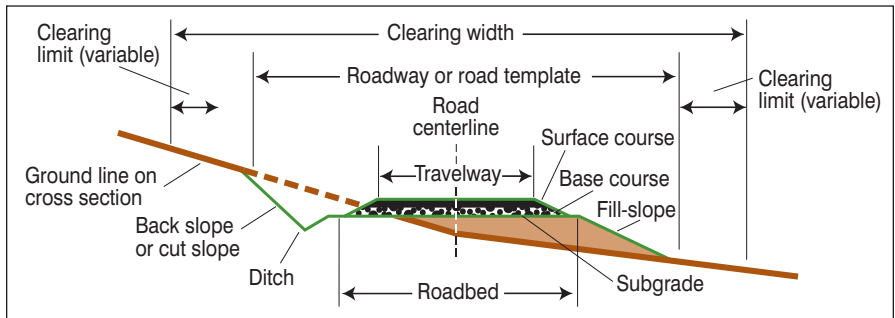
Road element nomenclature. Source: Brian Kramer
